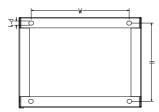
Installation Dimensions of Anchor Bolt of Base
